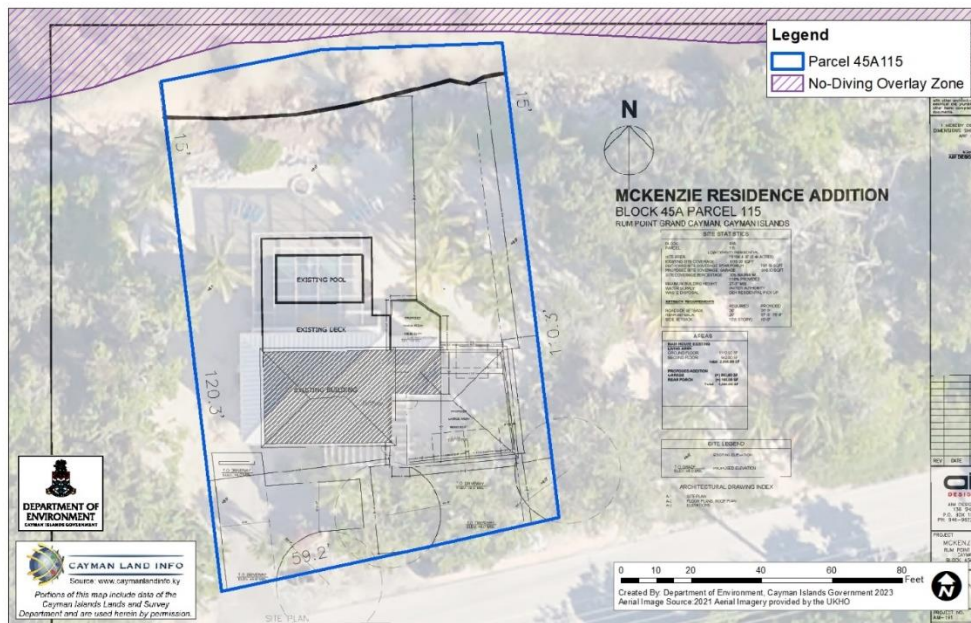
The application site with the parcel boundary highlighted in blue and an overlay of the submitted architectural plans (Aerial Imagery Source: UKHO, 2021 & Architectural Plans Source: M. Gonsalves, 2024).
